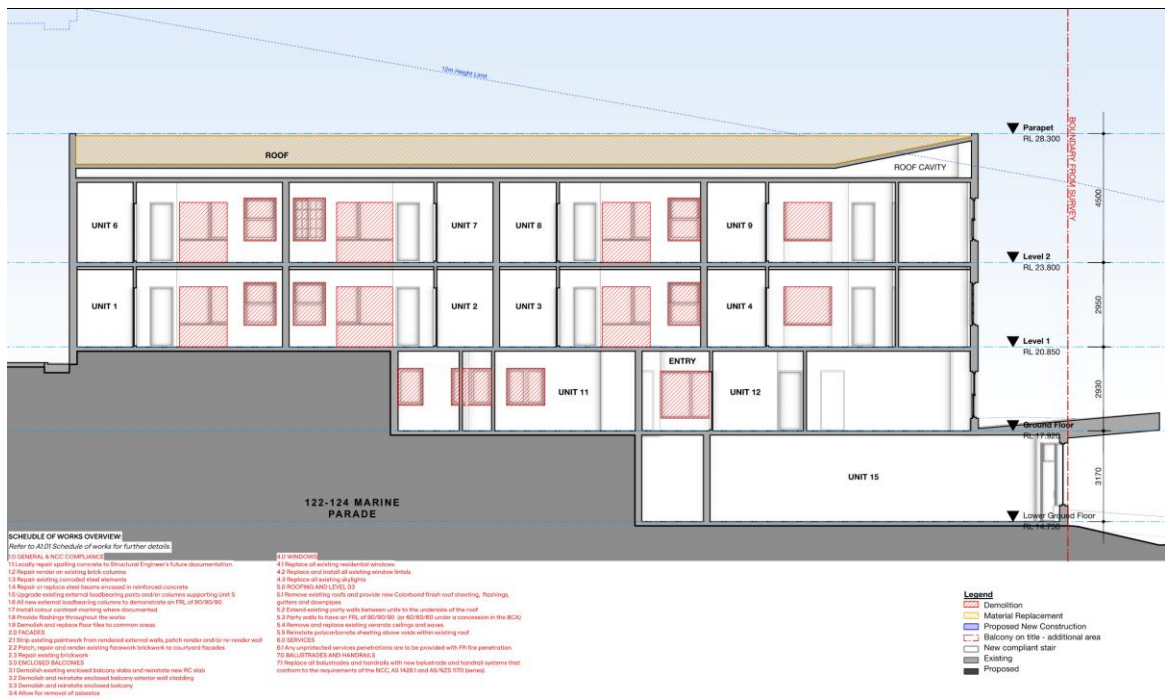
Long Section – Existing and Demolition (Source: Hill Thalys – 05/12/2025)
